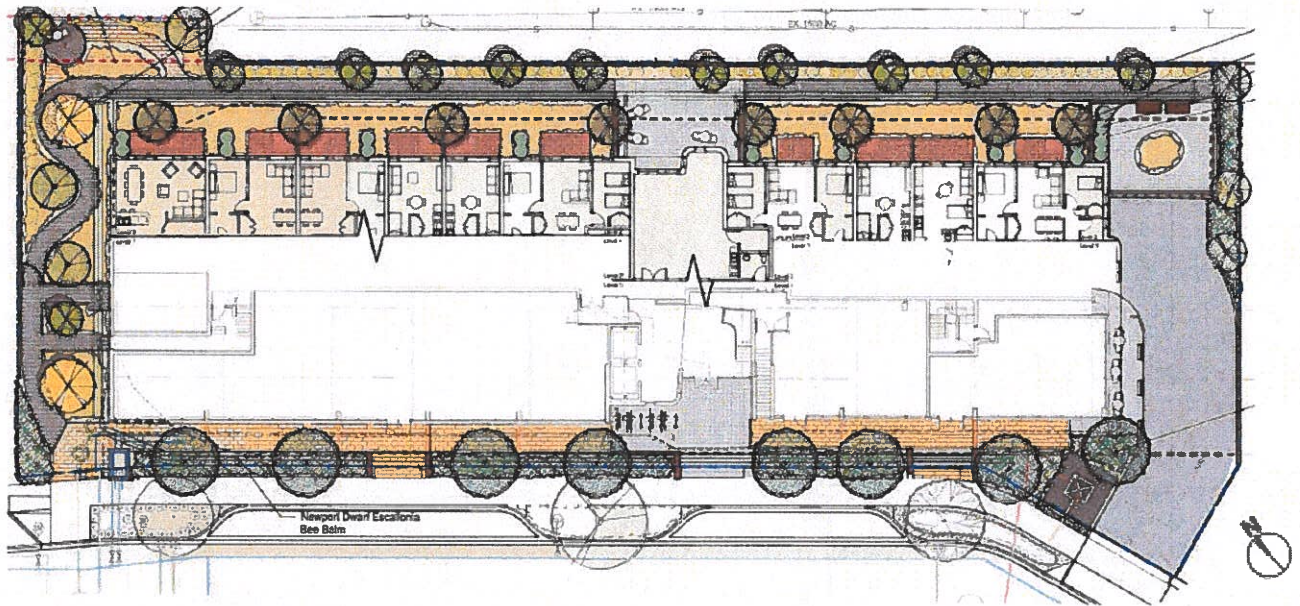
Nigel Valley Illustrative Site Plan (from plans by Cascadia Architects Inc.)
